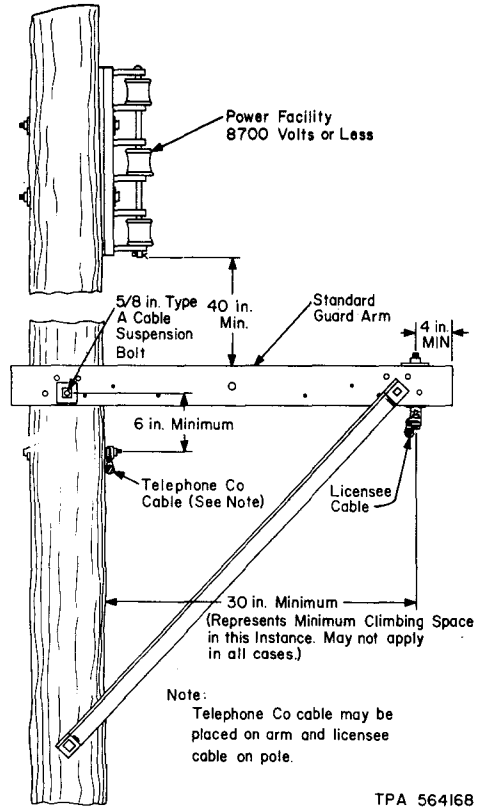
Installation of Wooden Extension Arm—Single Guard Arm Fixture
